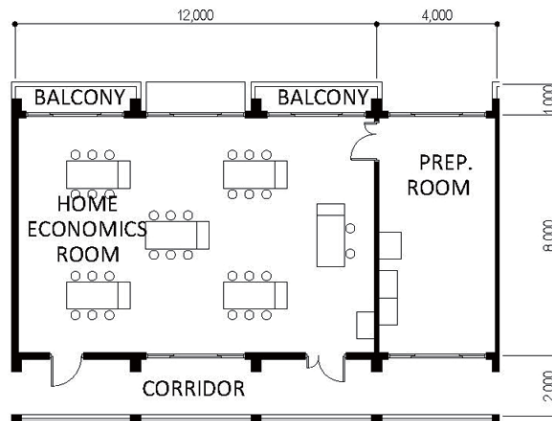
Floor Plan of Home Economics Room and Preparation Room
